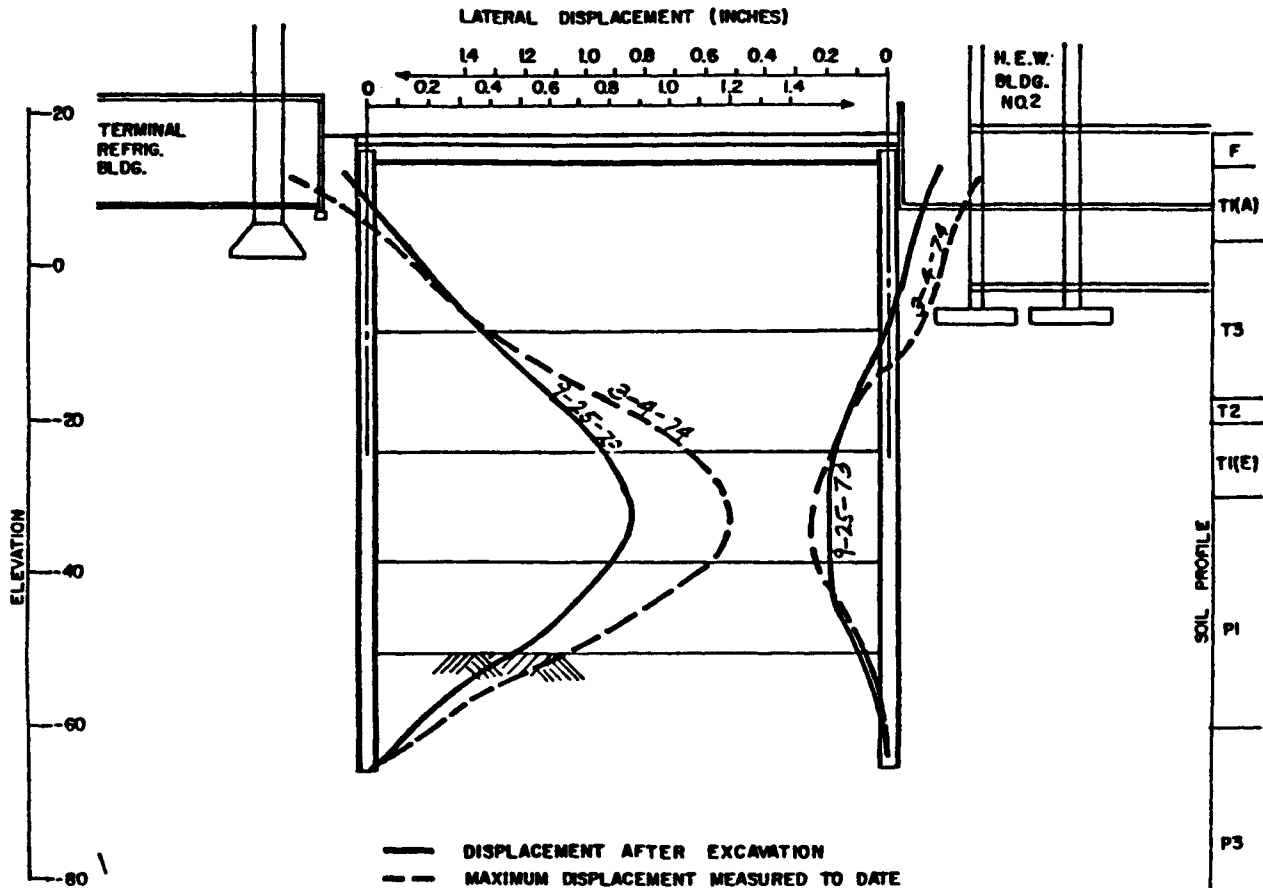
Observed wall movement for excavation adjacent to H.E.W. Building, and Terminal Refrigeration Building. (From Ware et al., 1979.)
